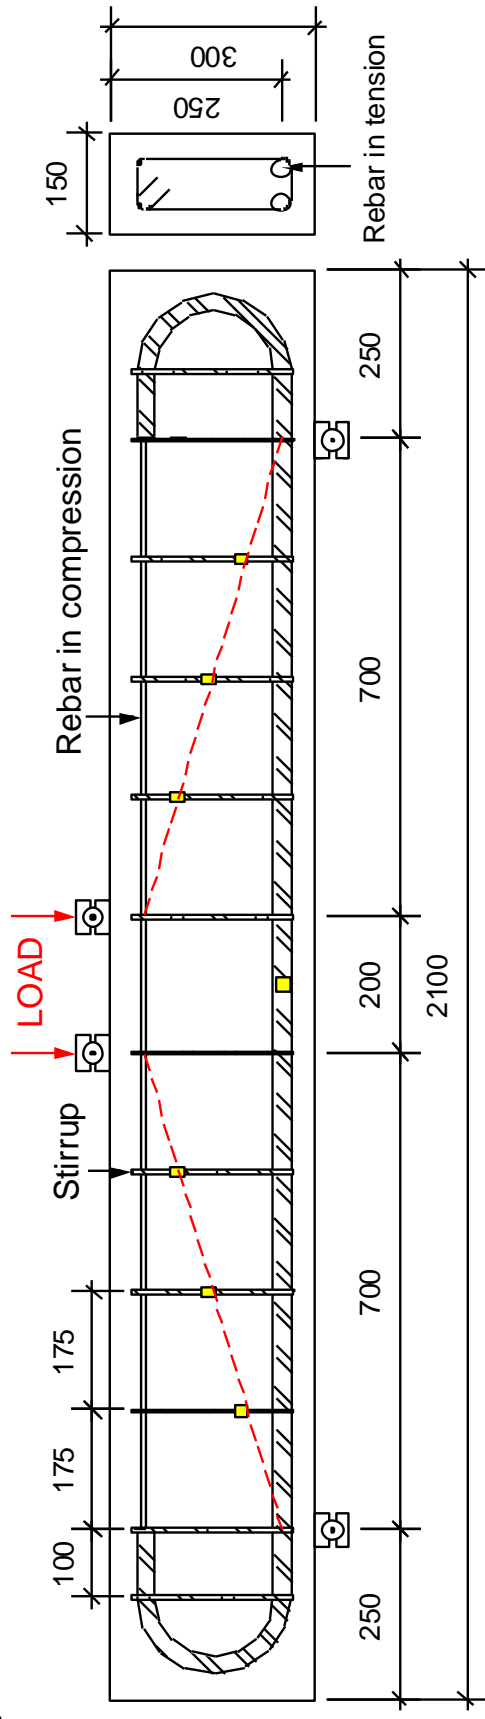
Dimensions and reinforcement details of RE-24.
